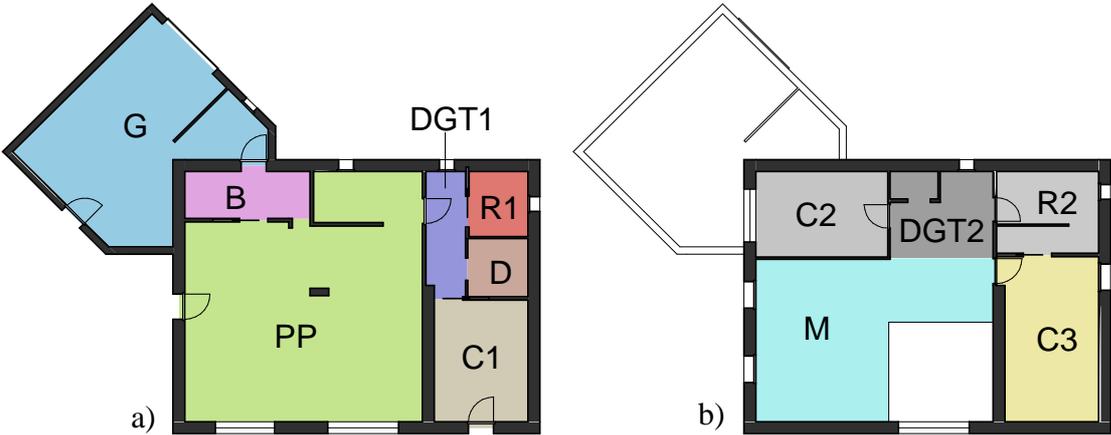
Plans of reference building, 1:200. a) First floor, b) Second Floor.
